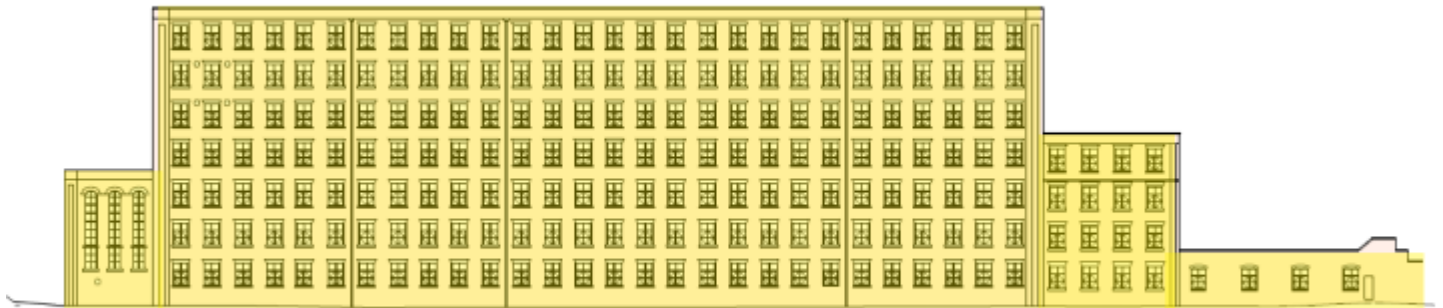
Brunswick Mill Elevations predominantly facing towards Ashton Canal
